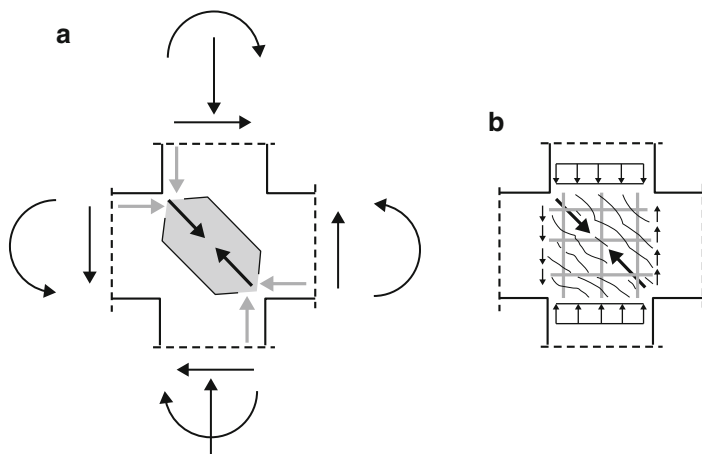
Strut mechanism (a) and truss mechanism (b)
